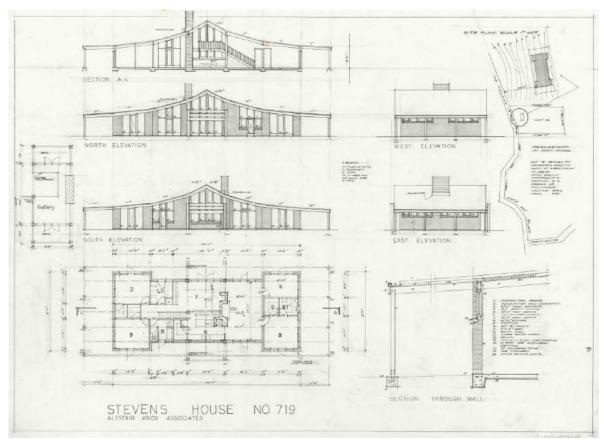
Plans by Alistair Knox for the subject house for the Stevens family, c1973. (Source: Alistair Knox c1973, YLTAD28-371, SLV)
